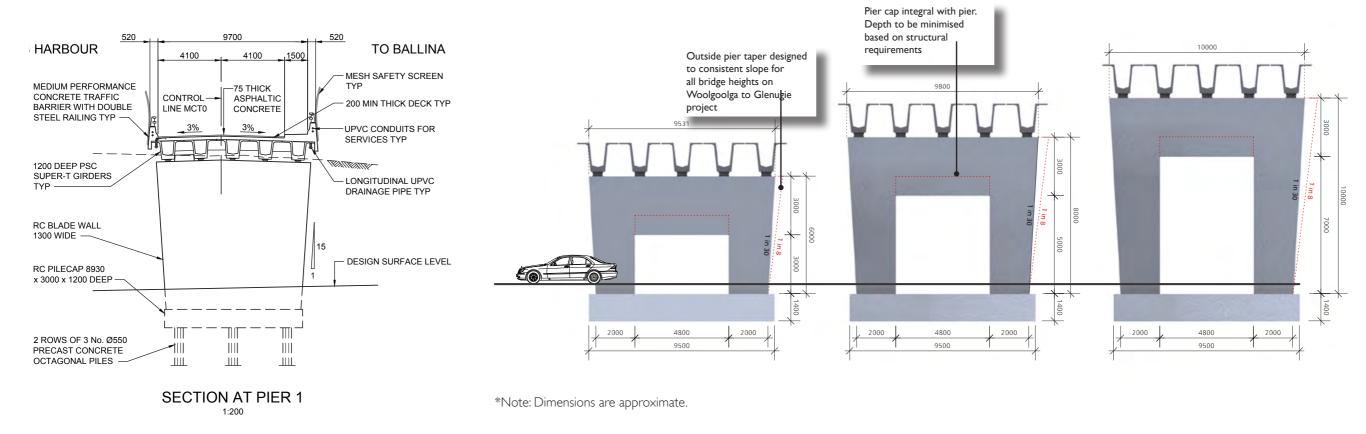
Overbridge concept design for Woolgoolga to Glenugie exhibiting solid blade pier
